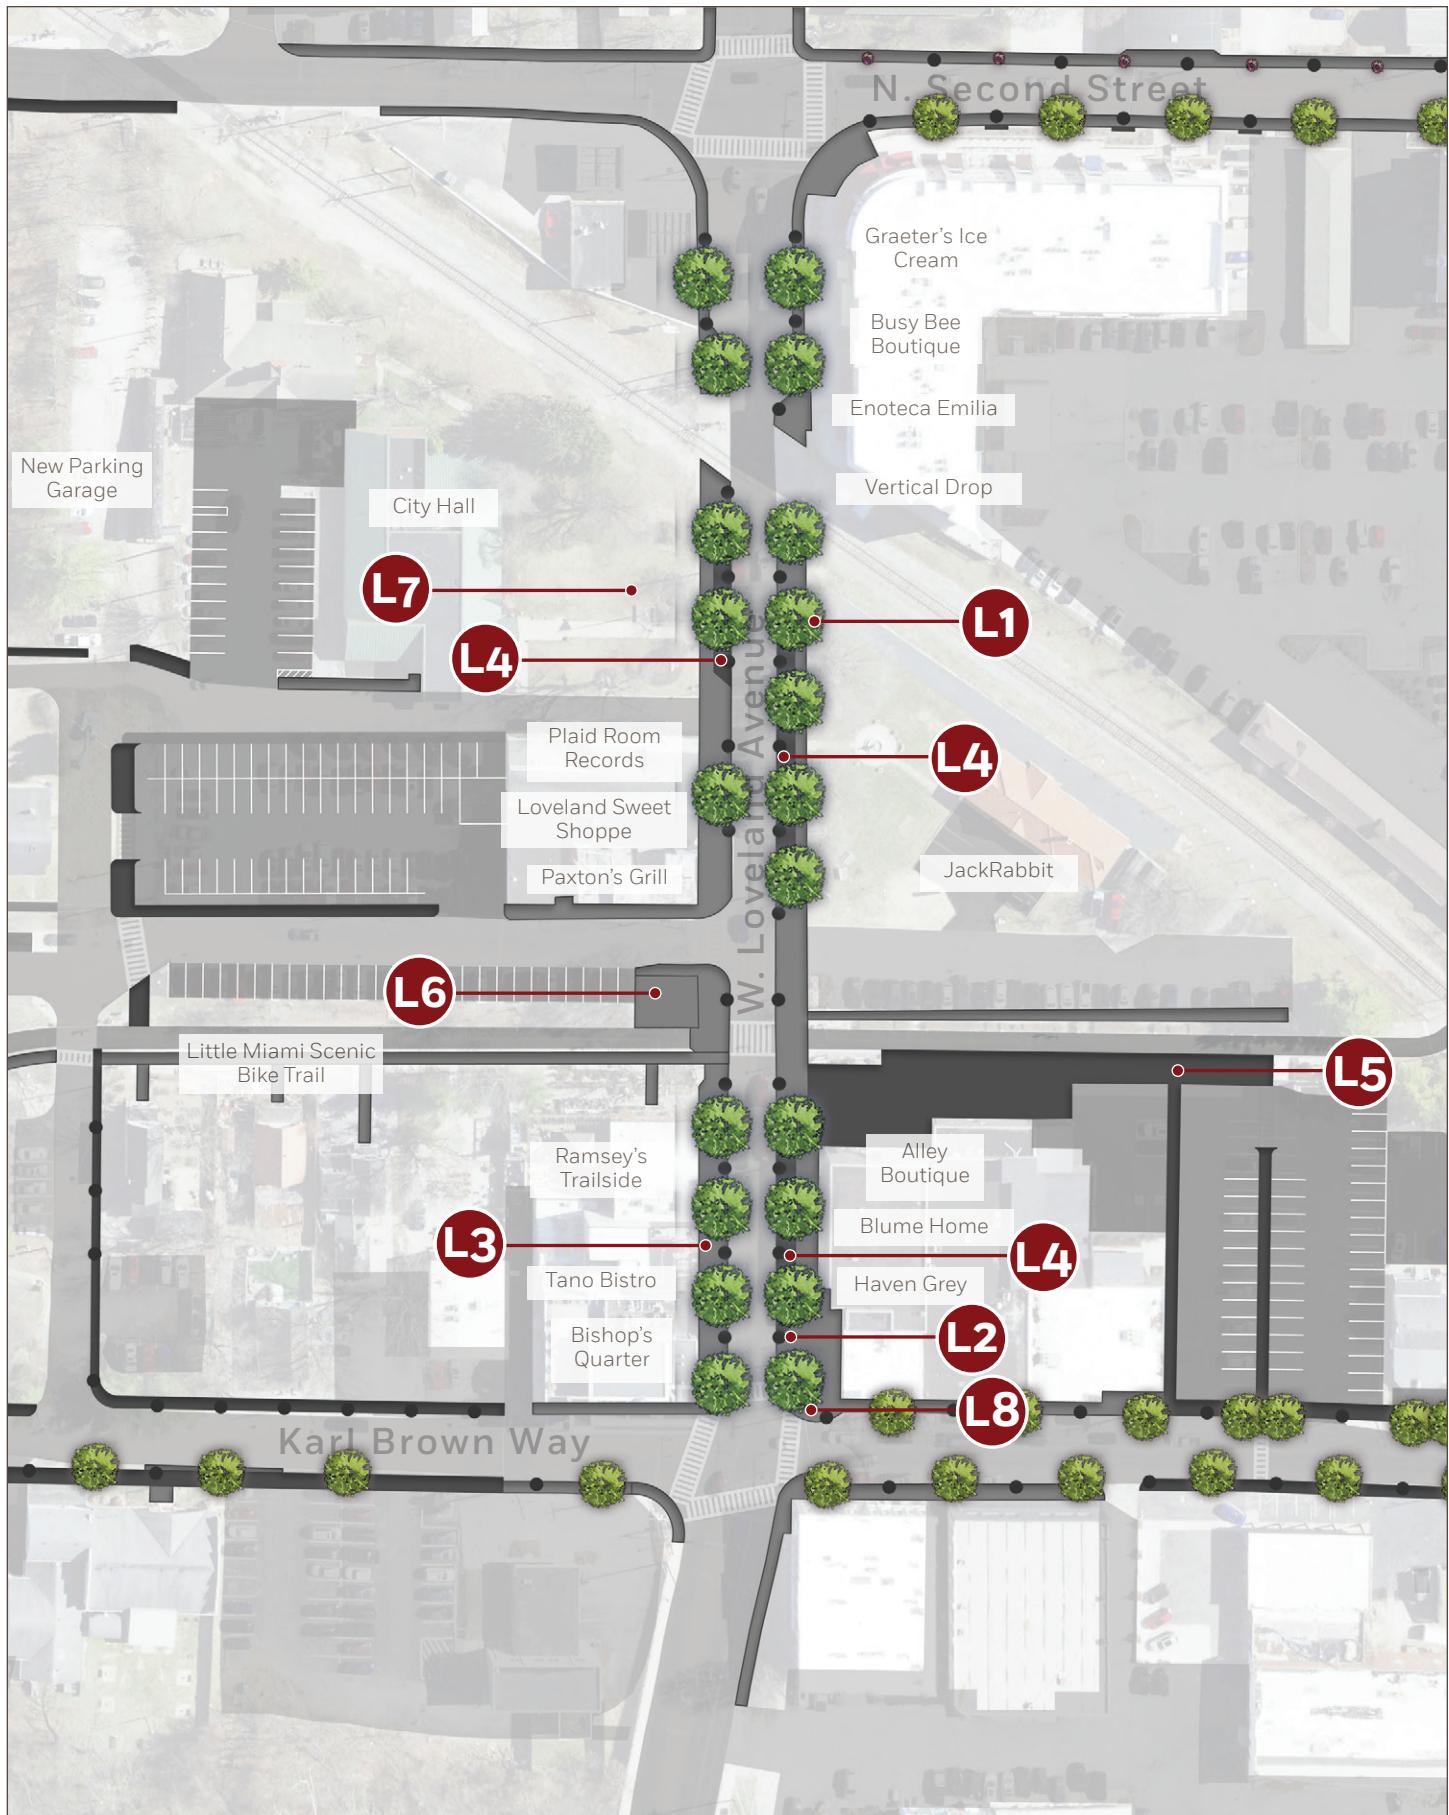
A conceptual plan for the entire W. Loveland Avenue Corridor.
